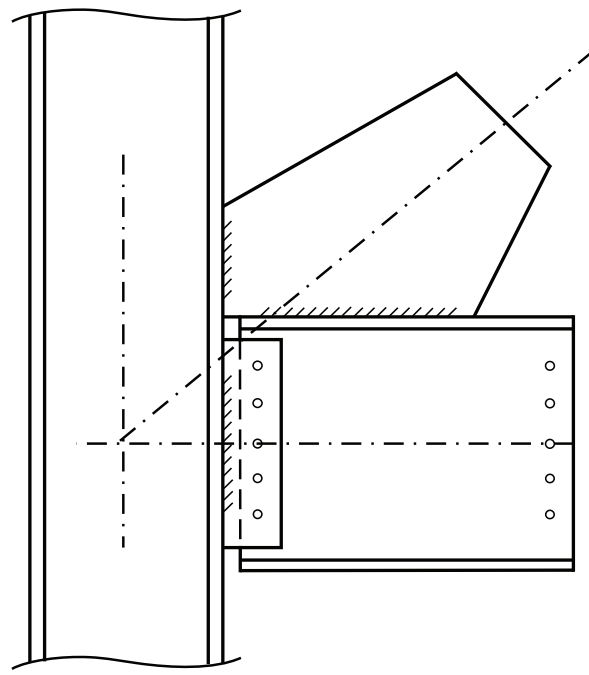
a shows the current detail for gusset plate connection, called connection Type I. The proposed configuration, called connection Type II, is shown in Figure 5.1.b. As can be seen in this figure, the gusset plate is only connected to the column. The top flange of the beam is coped in order to reduce the eccentricity between
